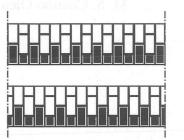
Pictures of a 2 bat wall and a 2 1/2 bat wall with the bond described above
